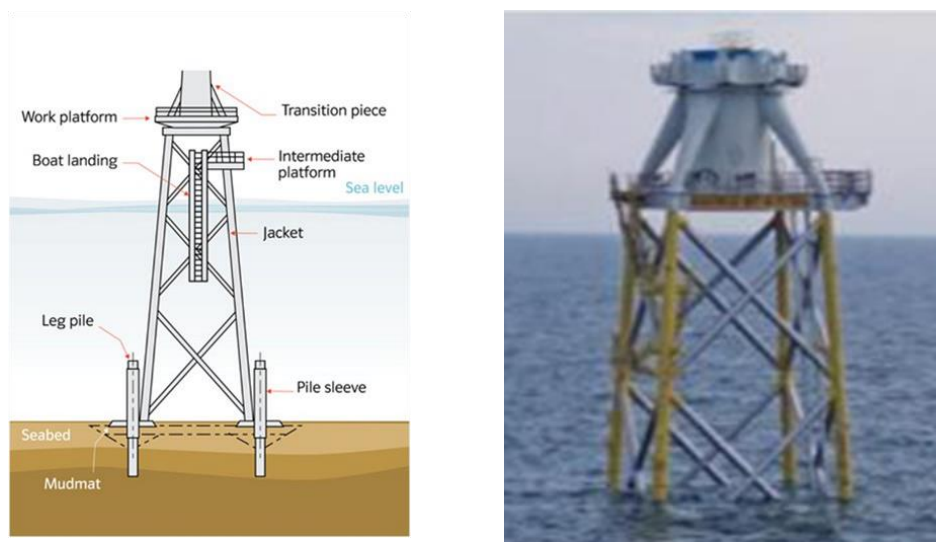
Standard jacket foundation components and transition piece detail [6]
